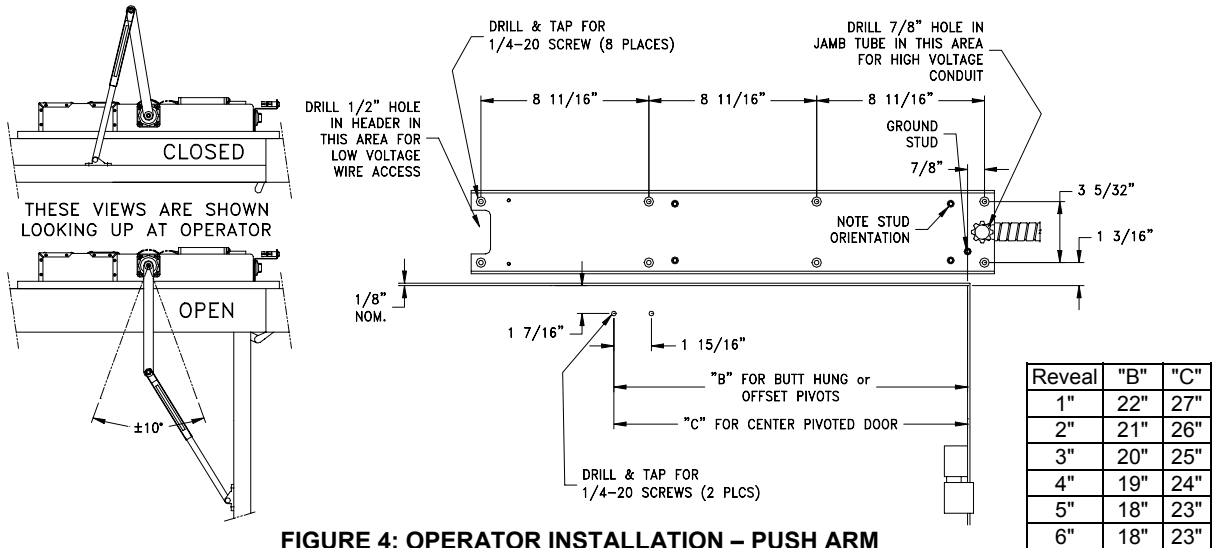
OPERATOR INSTALLATION – PUSH ARM
